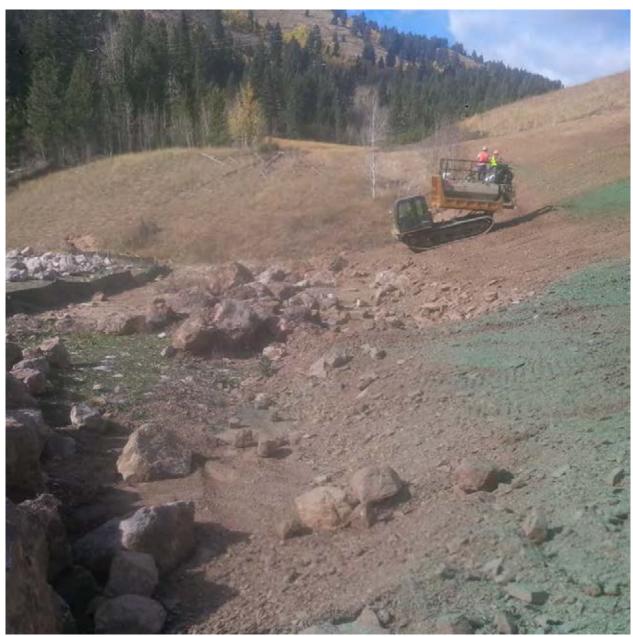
East Sedimentation Basin with rough spillway requiring completion by removal of oversized rip rap and installation of concrete cutoff wall at control section.
